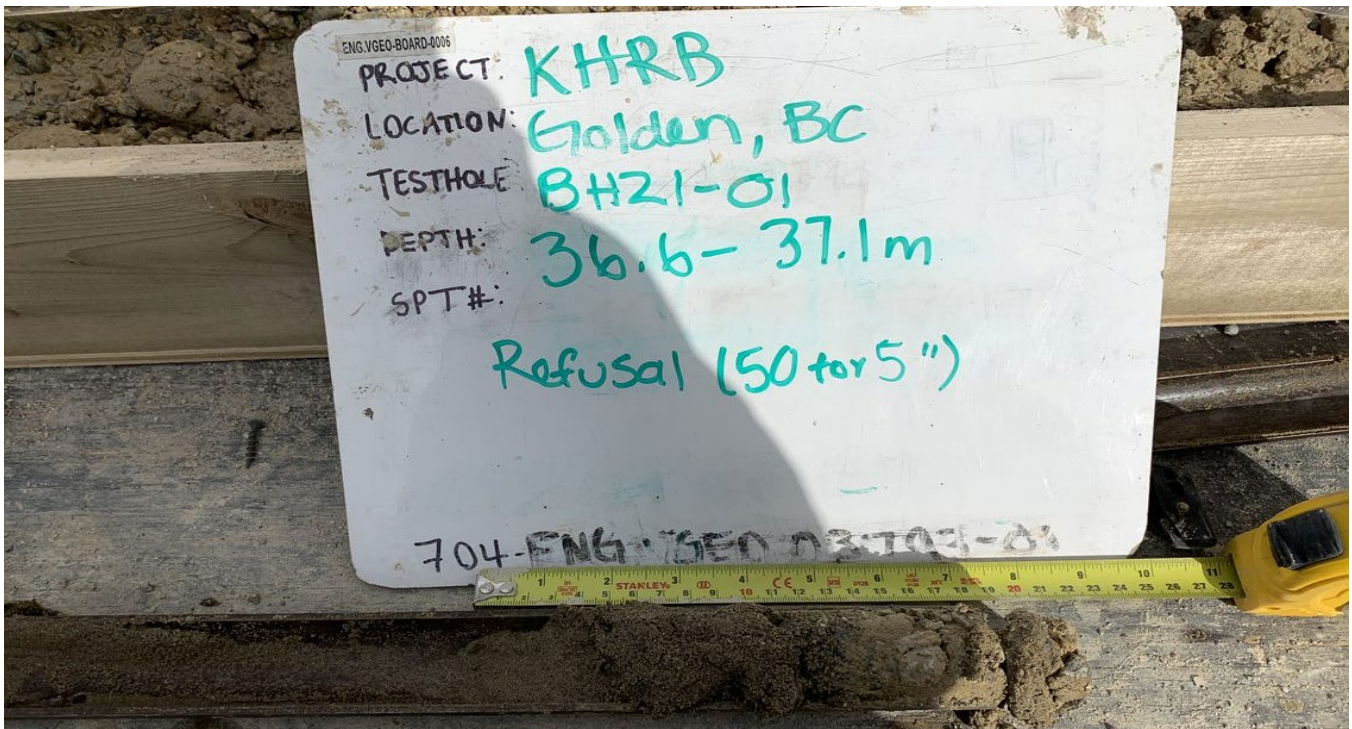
BH21-01, SPT-16, 36.6 m to 37.1 m
